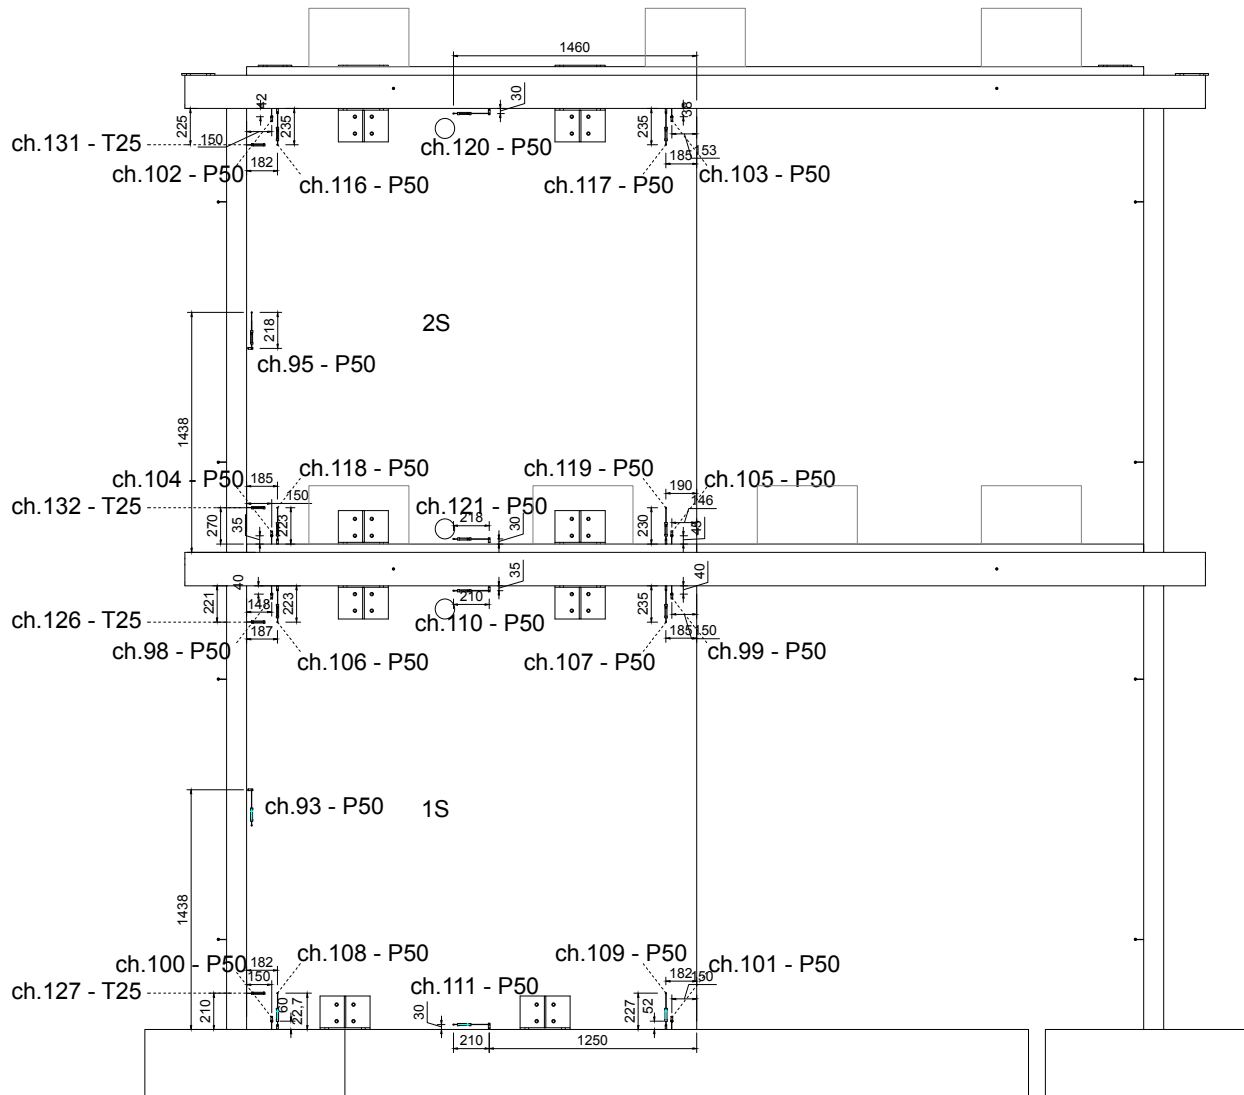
Installed instrumentation: side views of the specimen – Stability walls, East.
